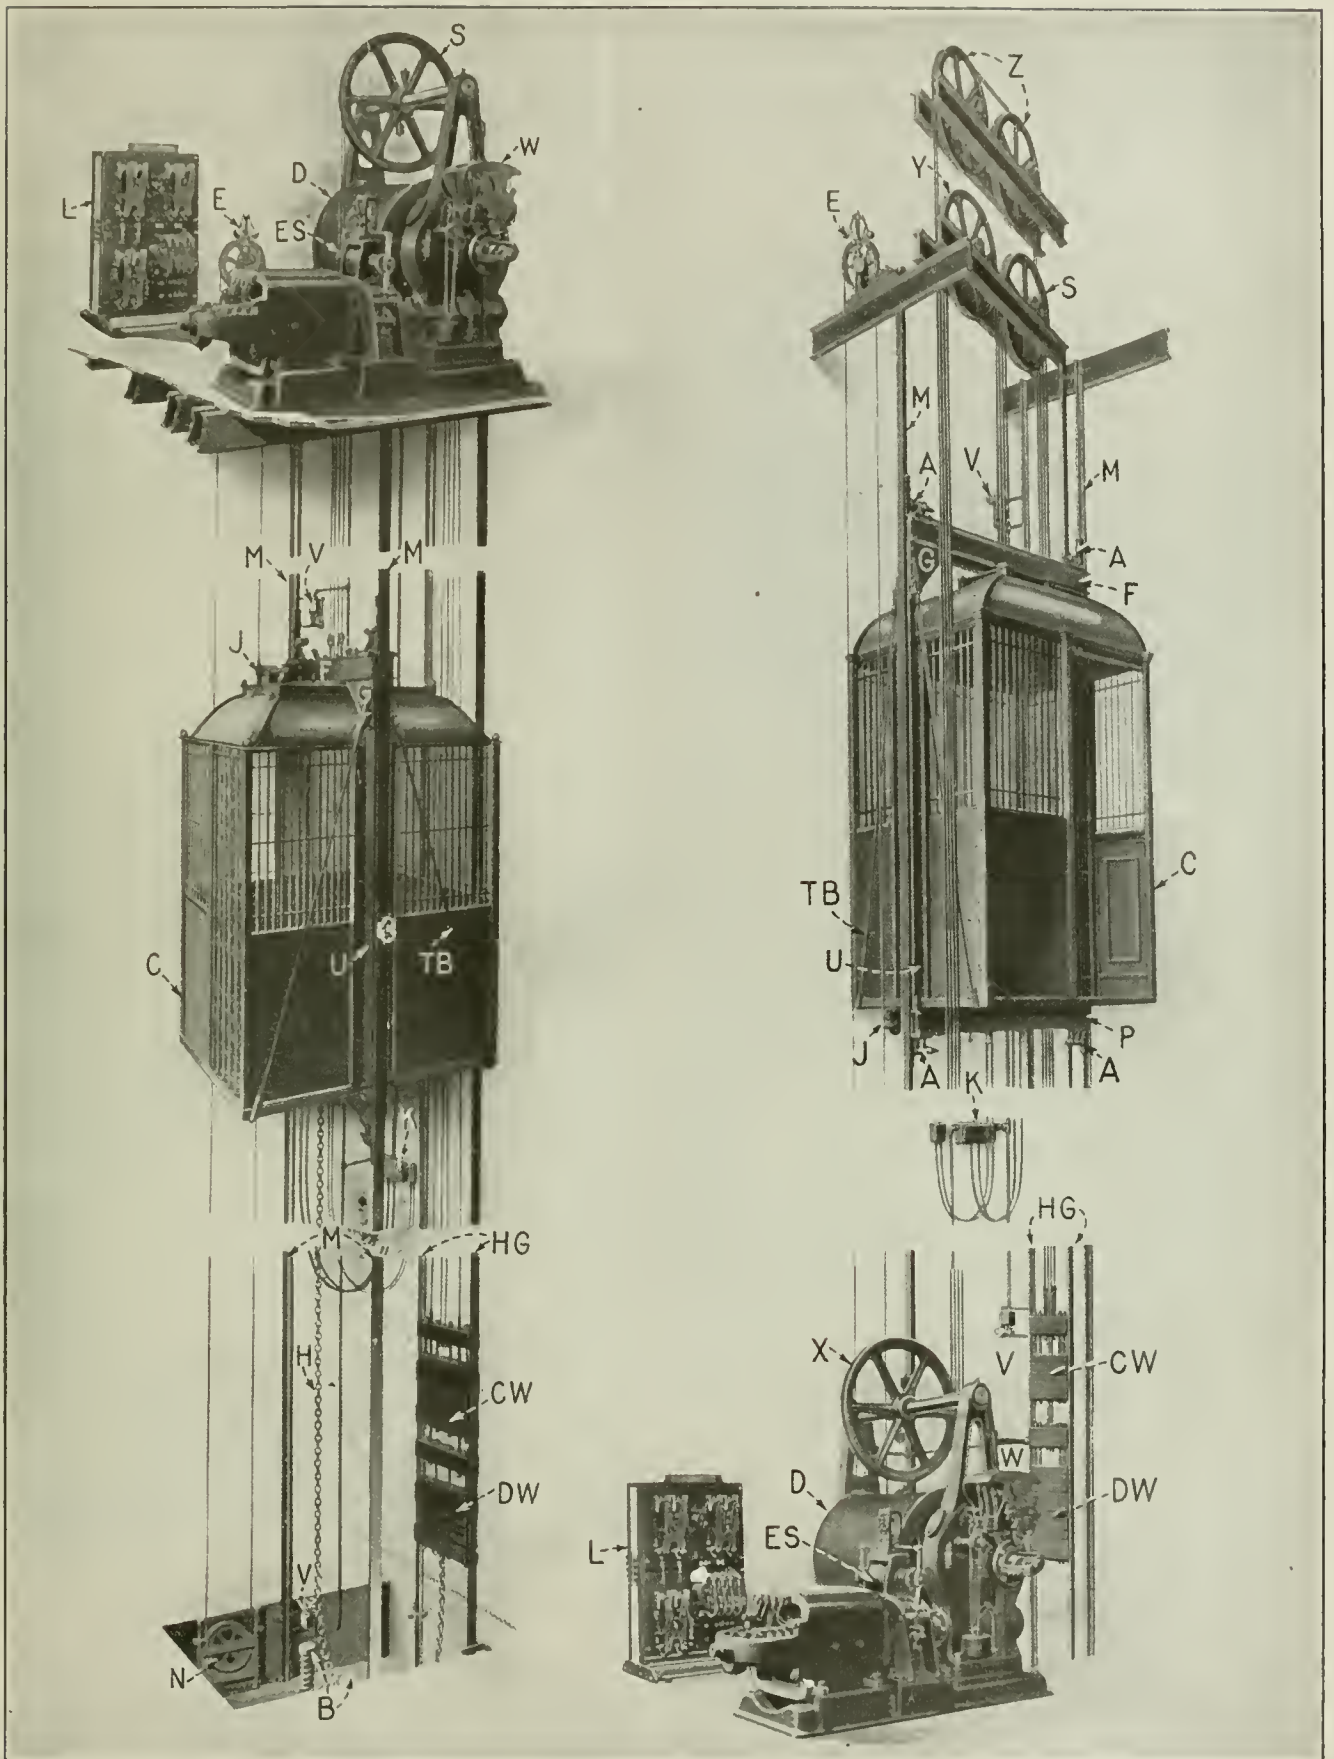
WINDING-DRUM-TYPE ELEVATOR MACHINE; OVERHEAD INSTALLATION
